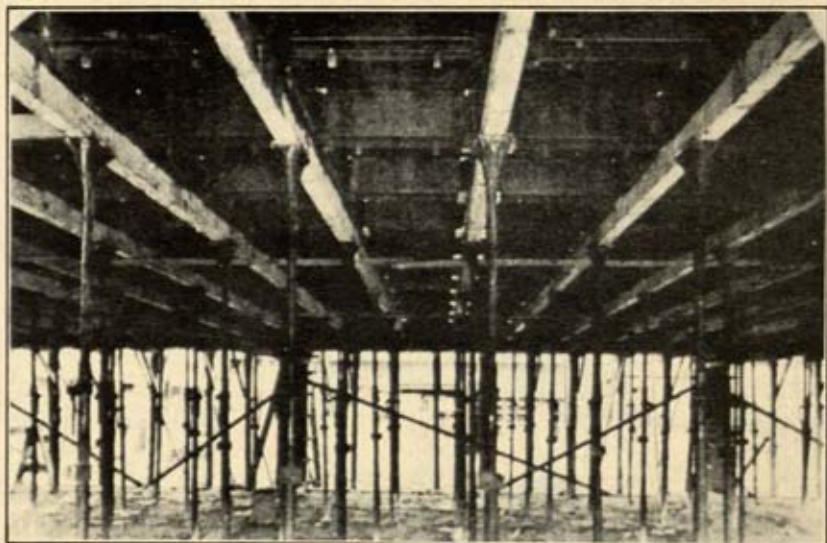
c. Metal-pan-type concrete-floor construction. (*J & B Manufacturing Co.*) (a) Method of supporting metal pans.
